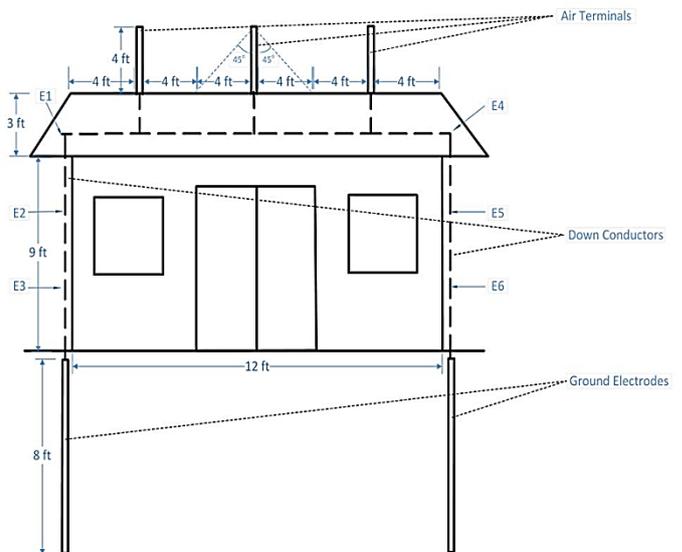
Lightning arrester system designed for typical rural house of Bangladesh
